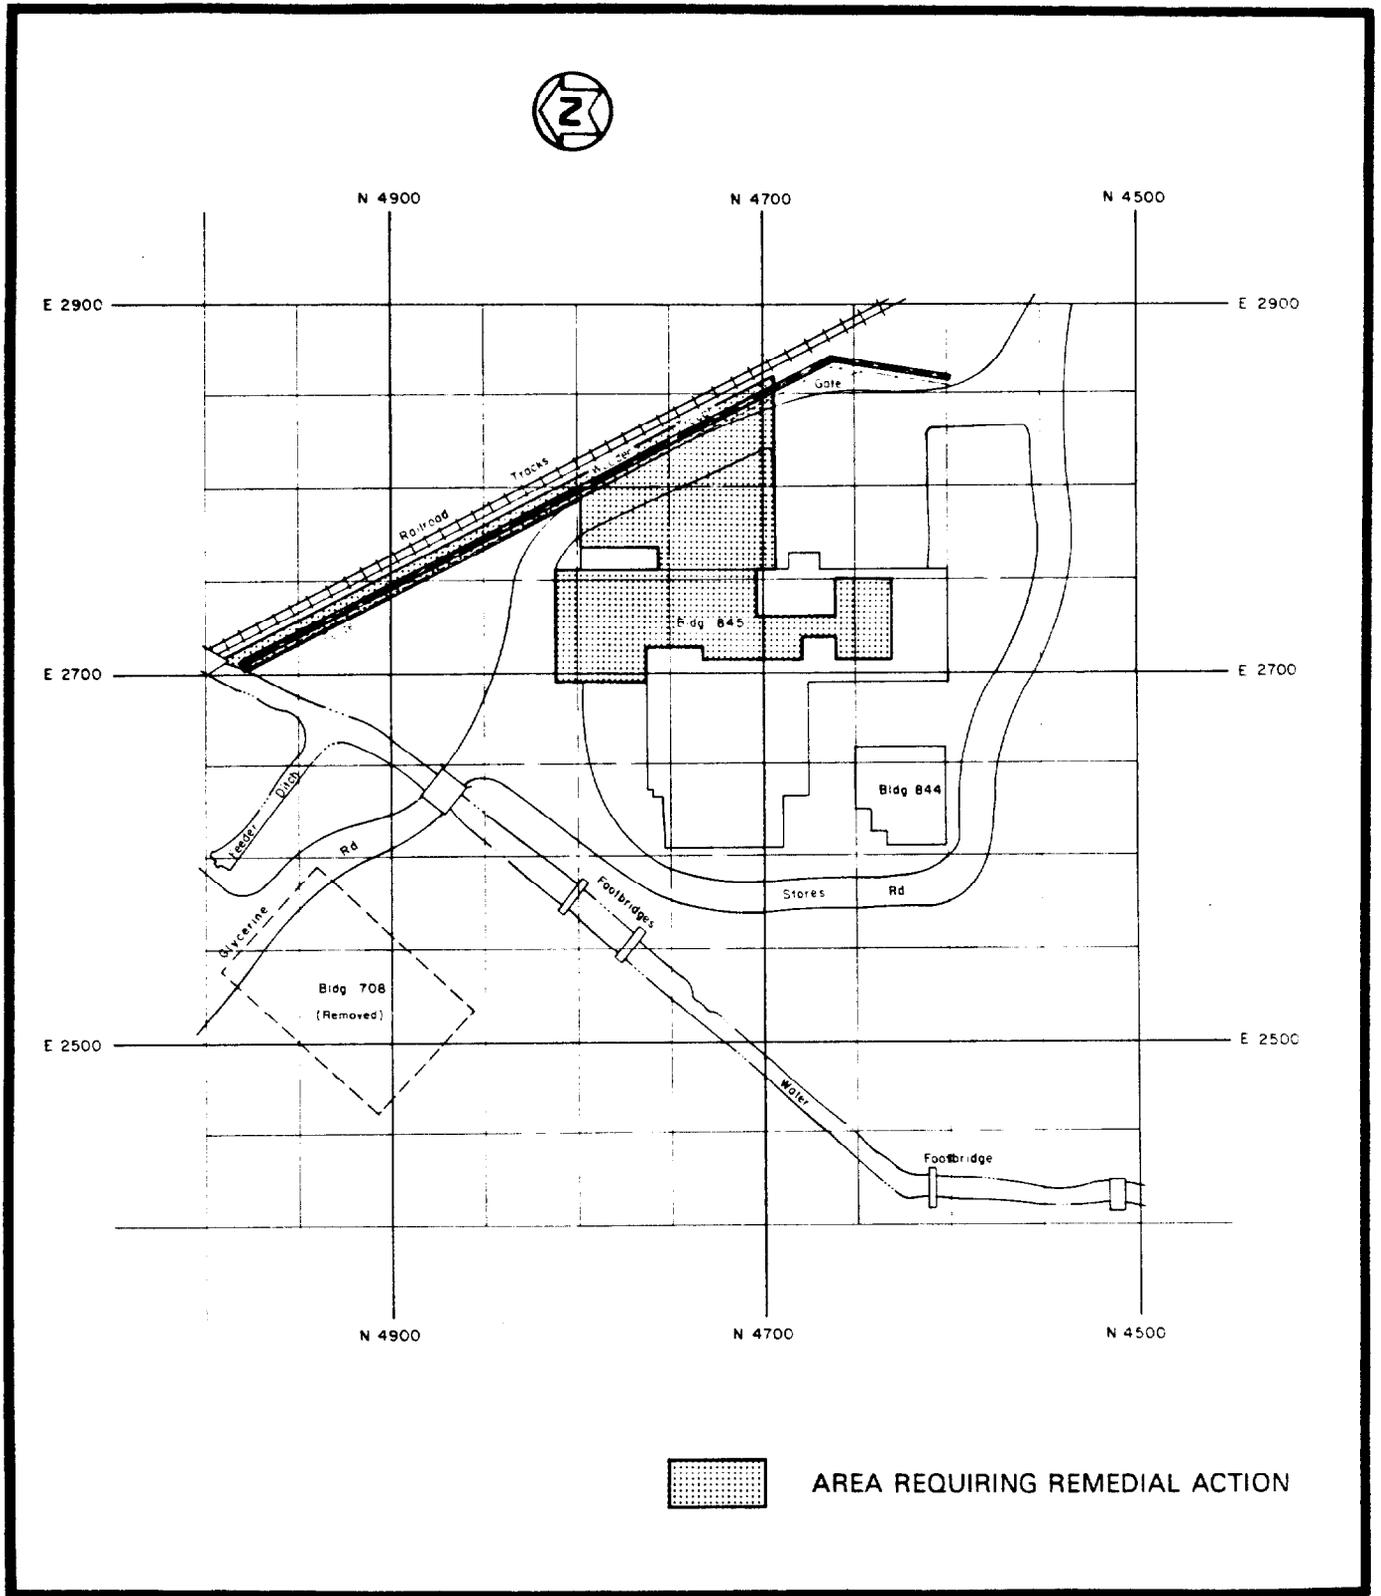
BUILDING 845 AREA AND WOODEN DRAINAGE TROUGH REQUIRING REMEDIAL ACTION
